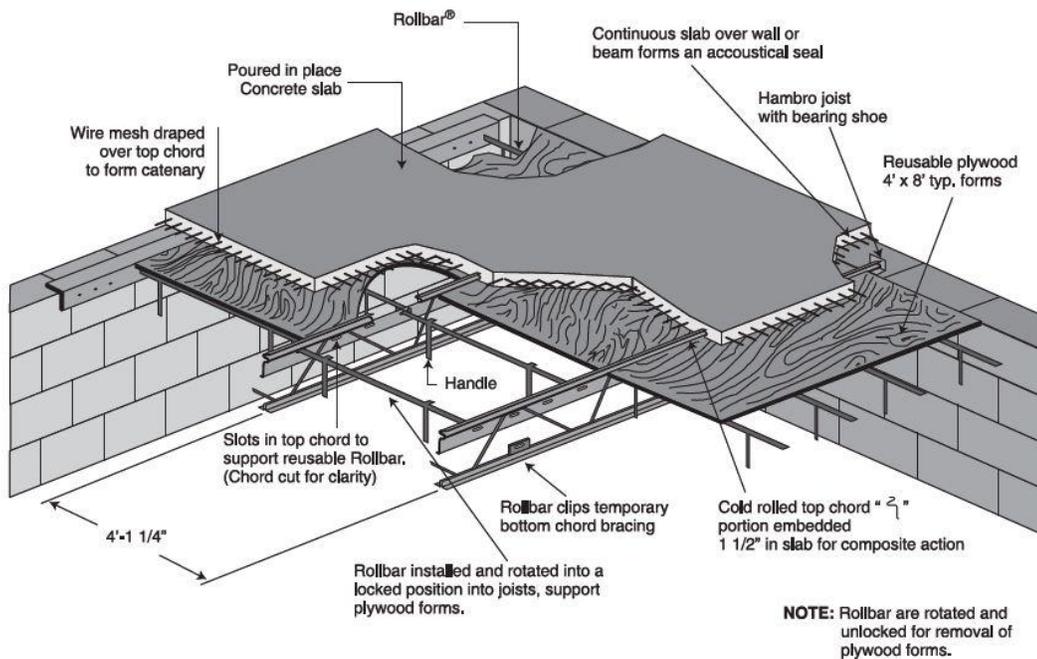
Hambro floor joist system. (Hambro Joist Company).
